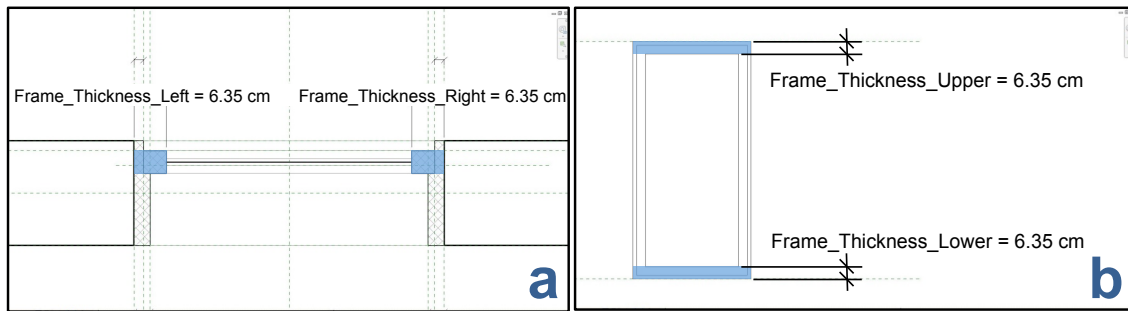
The Window family in Revit. (a) a plan view and (b) an elevation view.
